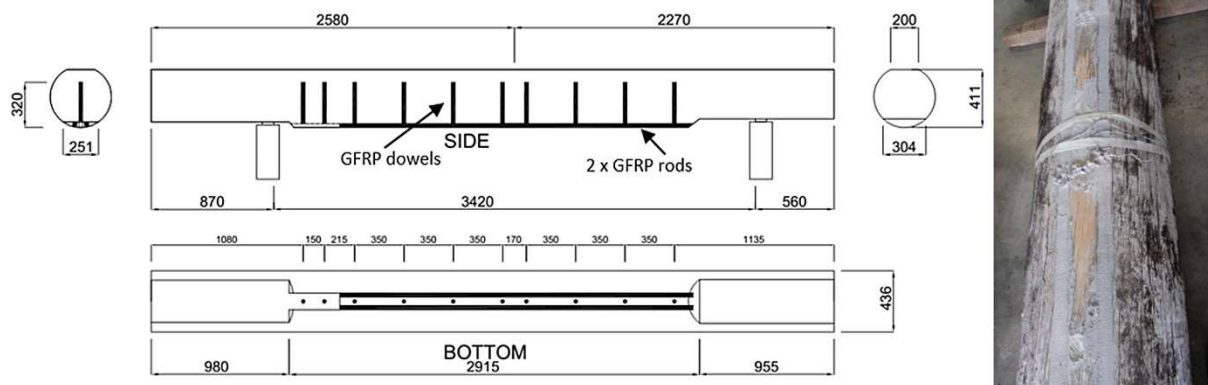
Strengthening of a girder using FRP rods in a near surface mounted profile and shear spiking [26]
